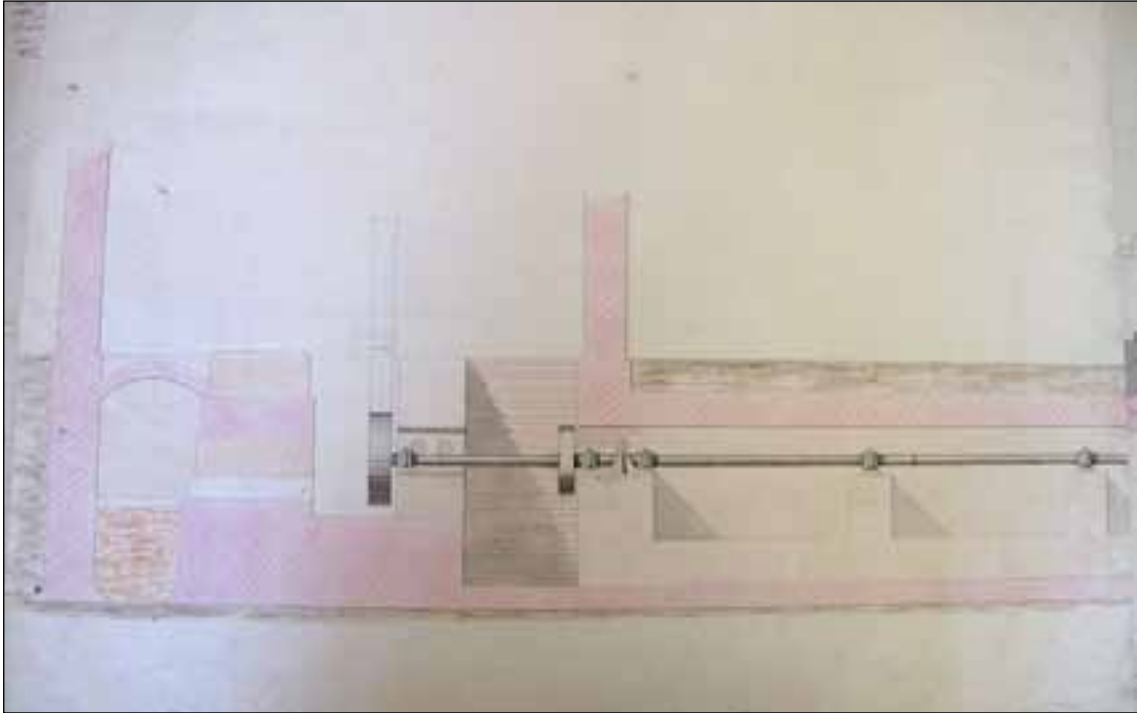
Section through tunnel connecting the boiler house to Haslar laundry (EHA MD95/2798)
